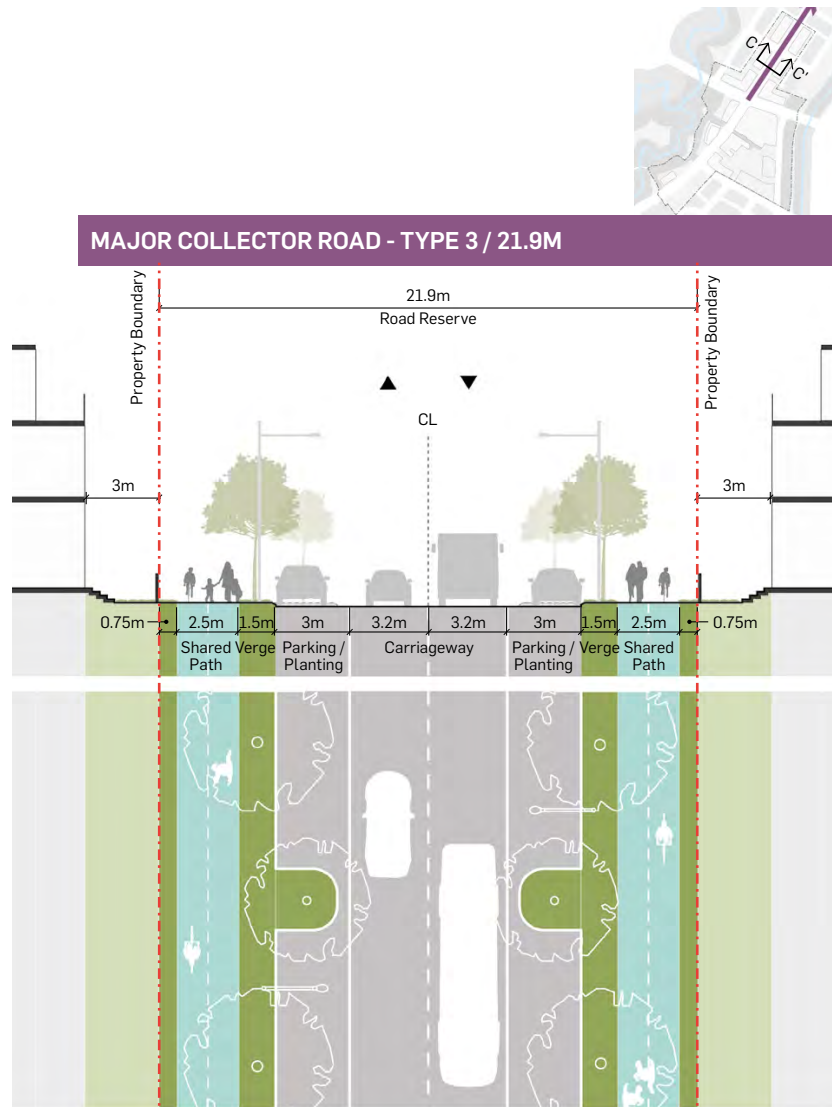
Indicative Street Section C-C' - Major Collector Road - Type 3
